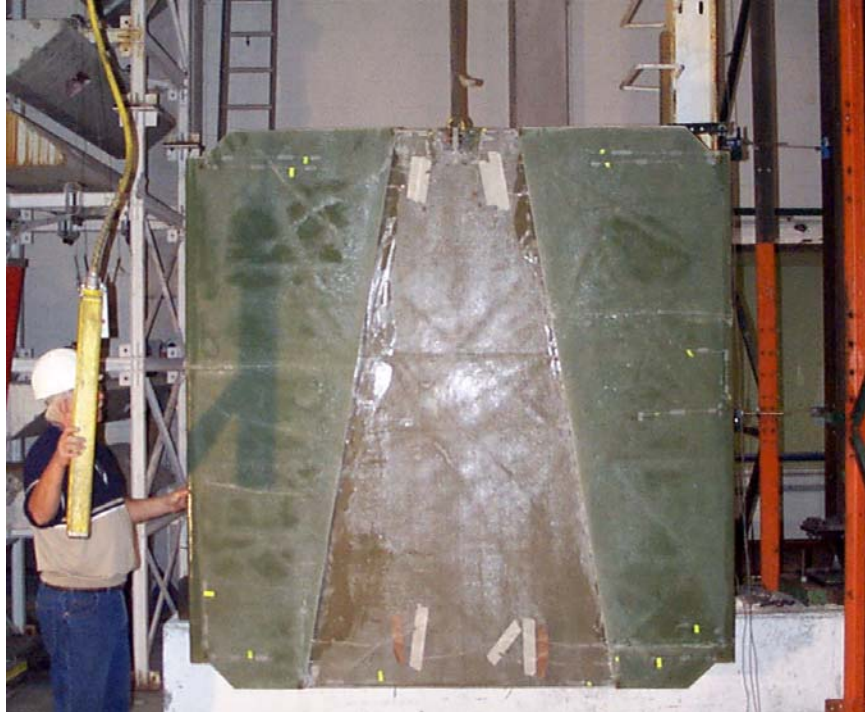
Completed Fabrication of the Multi-layer PMC Infill Panel
